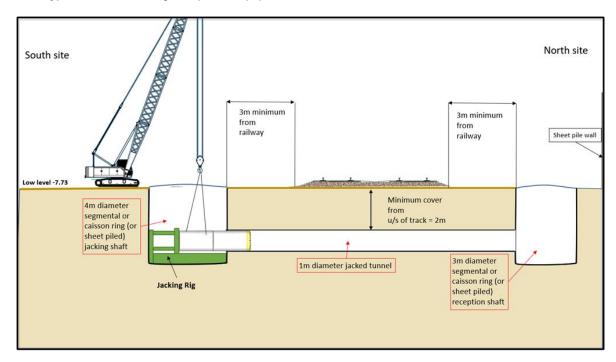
Cross Section A-A of a Pipe Jack or Auger Bore Arrangement Beneath the GSWR Railway
